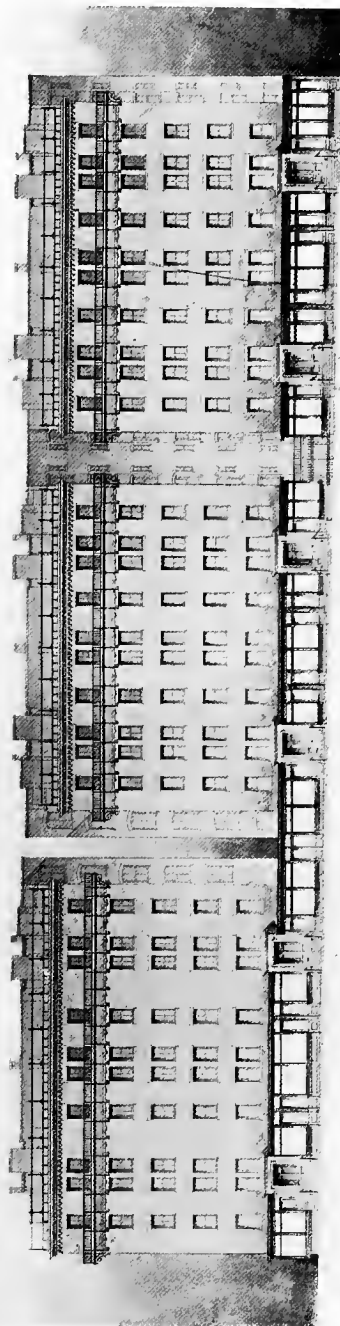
FORTY-SECOND STREET ELEVATION OF BUILDINGS FOR THE NEW YORK FIREPROOF TENEMENT ASSOCIATION.
